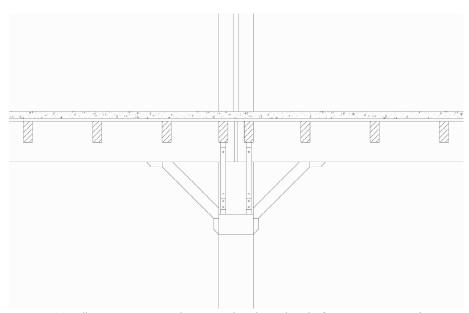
all operations together, new detail Gardenplatform construction 'BB.
